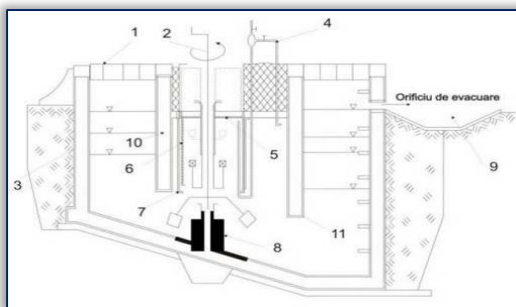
Small capacity biogas installation: 1 – wooden floor; 2 – stirrer; 3 – outer wall; 4 – gas outlet pipe; 5 – ballast on the wooden floor; 6 – plate bell (gas meter); 7 – exhaust pipe; 8 – bronze nut; 9 – exhaust duct; 10 – the inner wall of the feed chamber; 11 – the inner wall of the evacuation chamber
